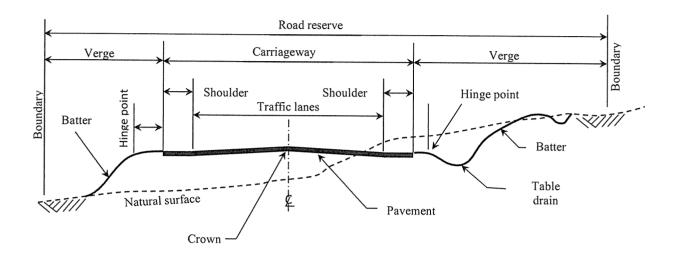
Typical rural road cross section (Source: Adopted from TNZ Geometric Design Manual, 2002).
